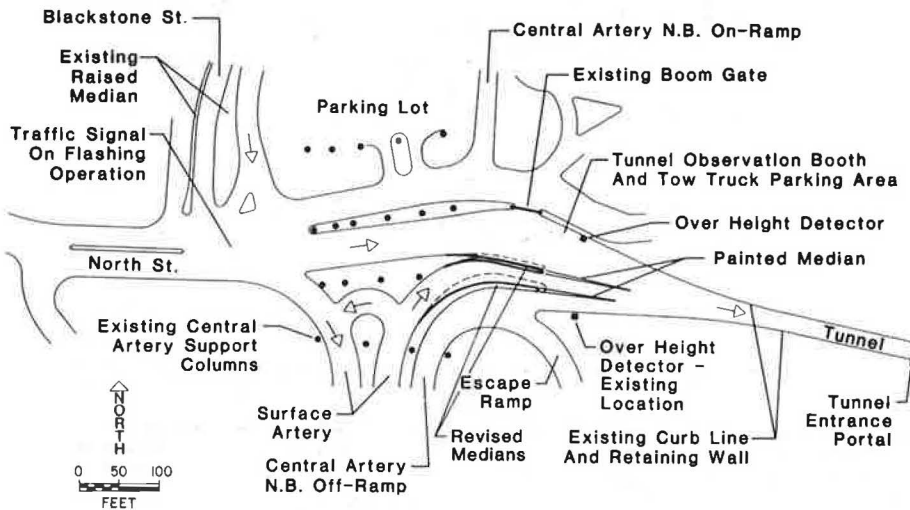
Alignment plan for Callahan and Sumner tunnels—exit road.
